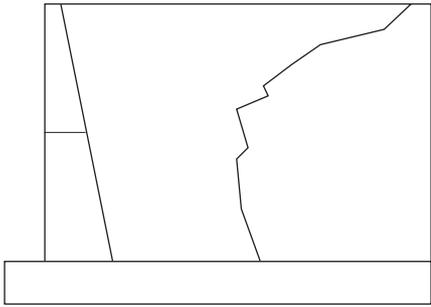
Jointing patterns used in UDEC analyses for Wall B
